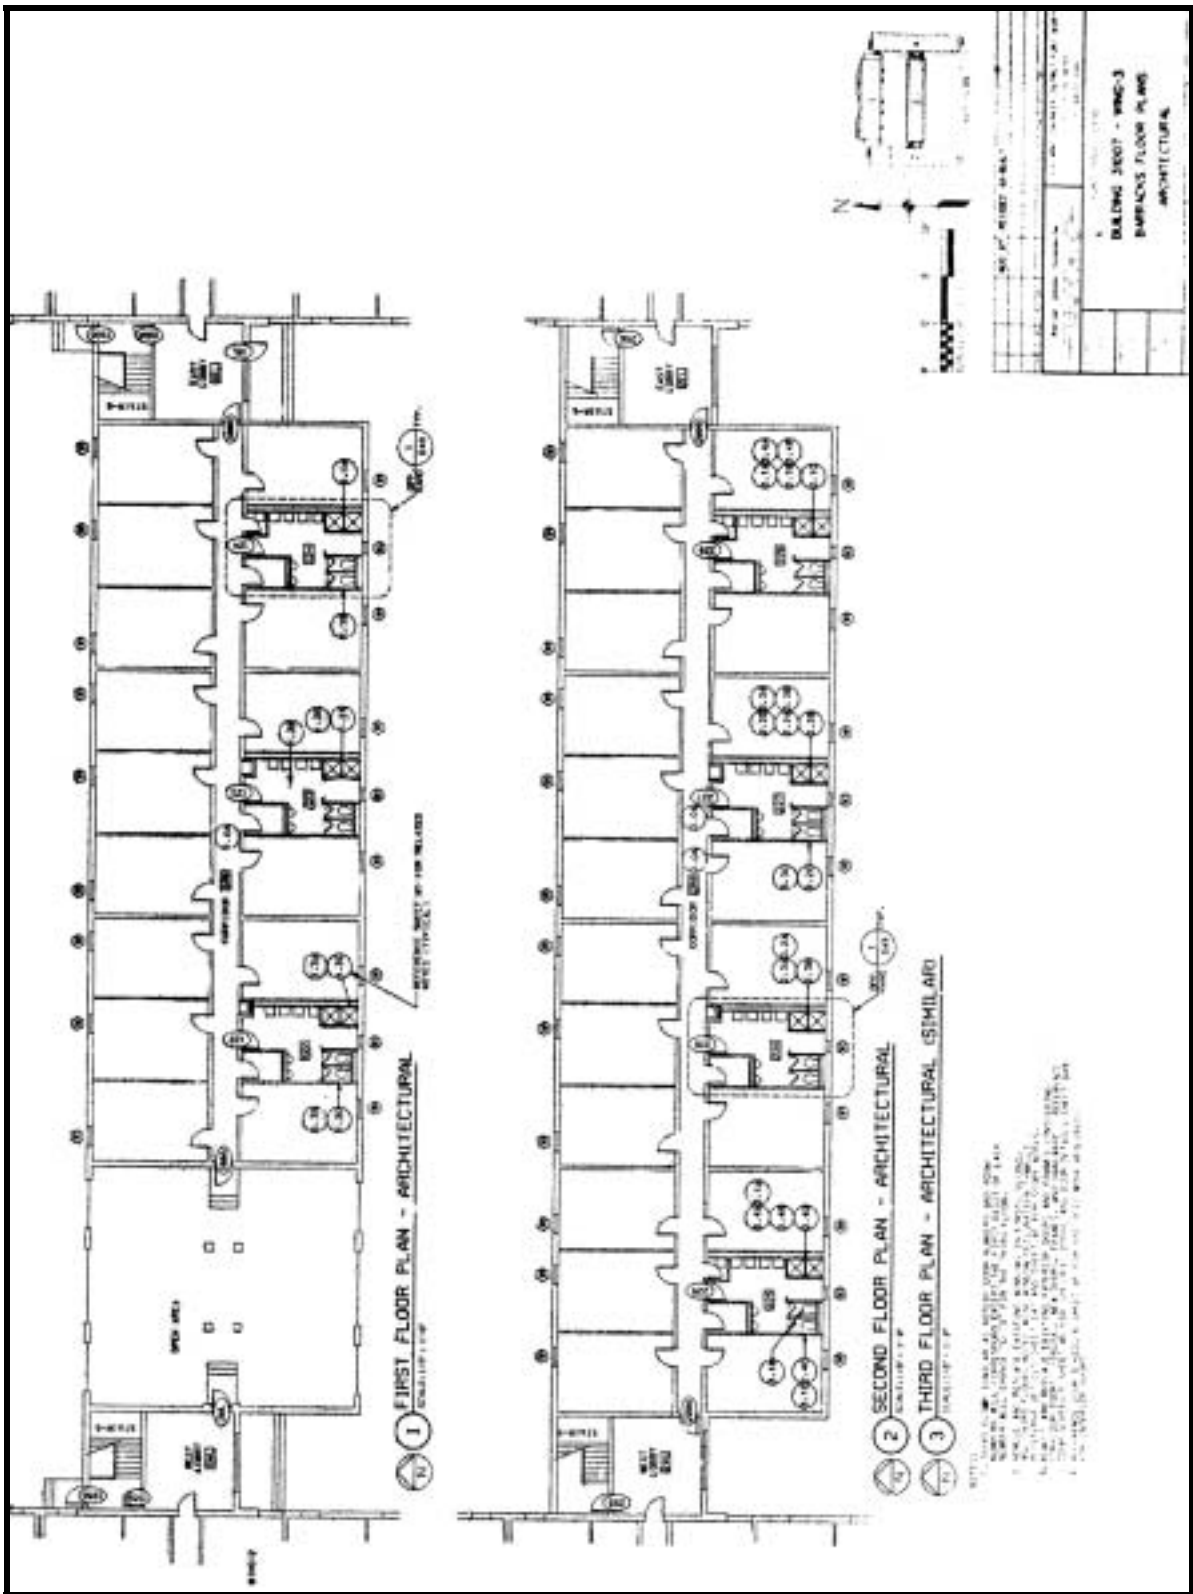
A-style barracks, Bldg. 31007 floor plans, wing 3 (ca. 1971, revised 1997) (Engineering, Ft. Hood).
